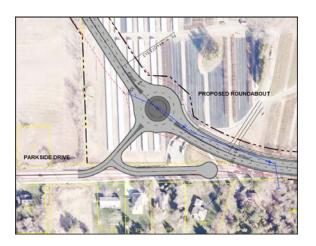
Parkside Drive realignment at West Roundabout
